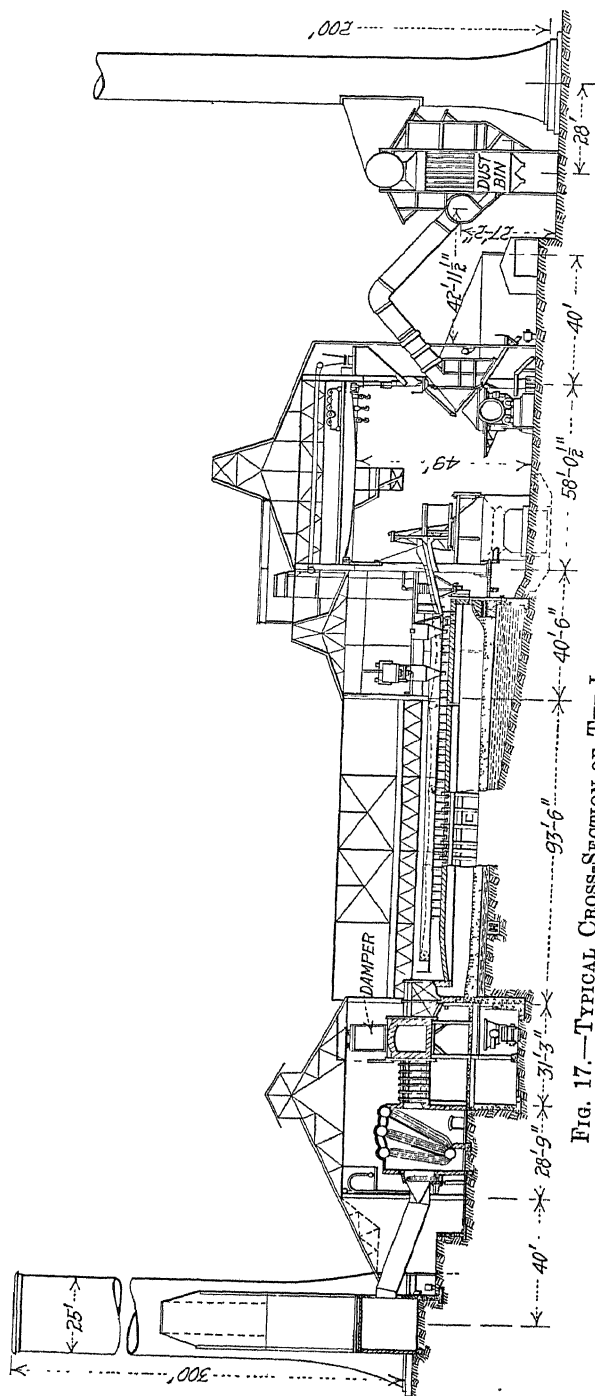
TYPICAL CROSS-SECTION OF THE INTERNATIONAL SMELTING CO.'S PLANT.
